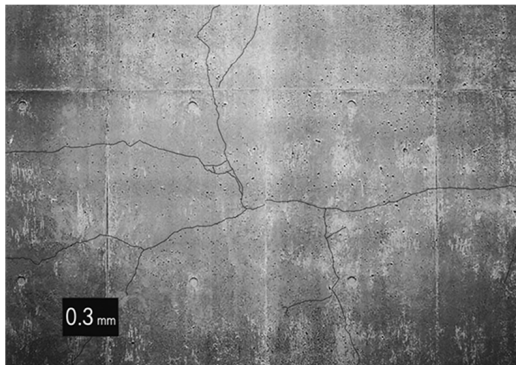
Crack image used in test (size: 570 mm × 420 mm)
